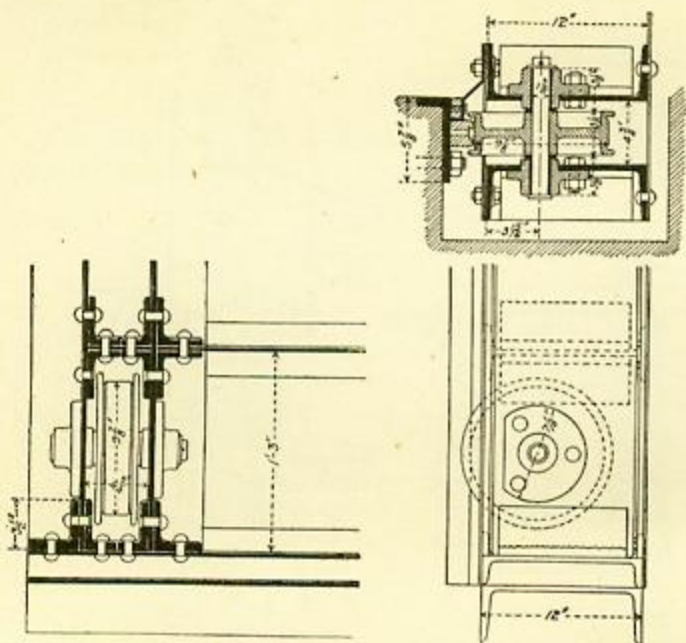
Details of Rollers and Wooden Bearing Strip for Steel Head Gate.
